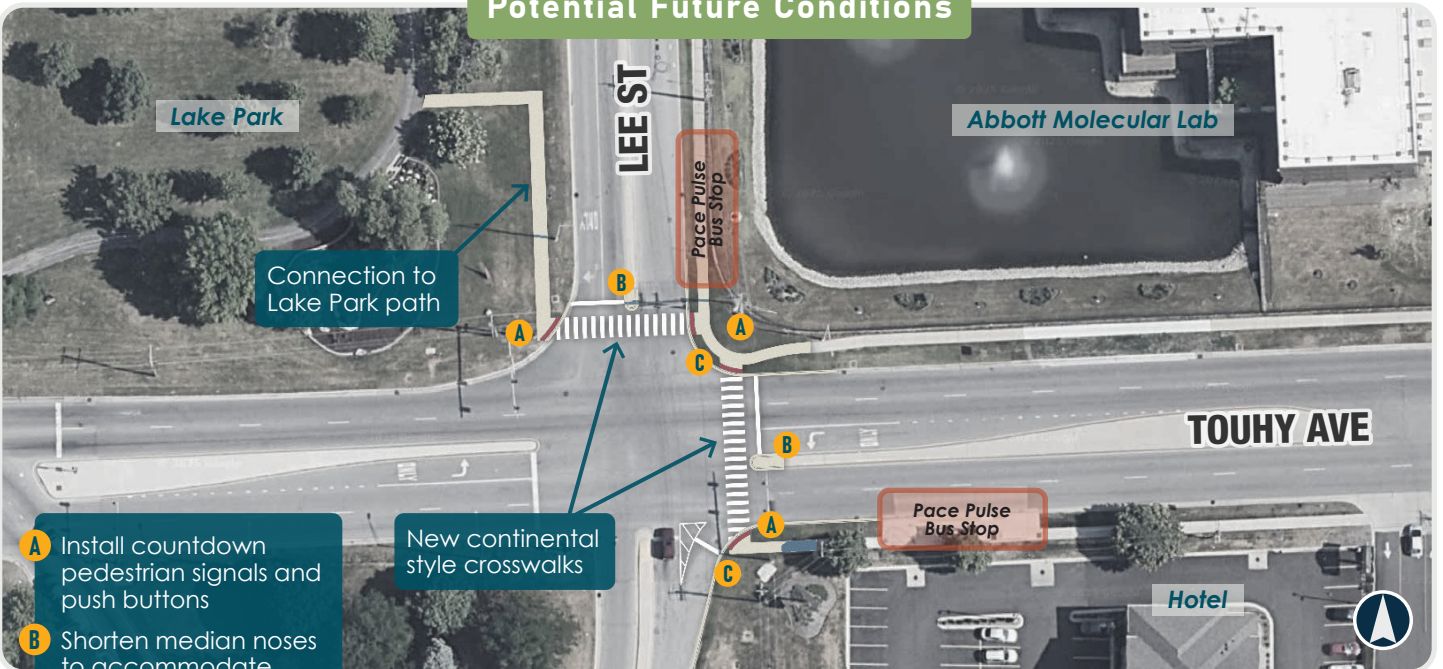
Touhy Avenue and Lee Street Potential Crossing Improvements
